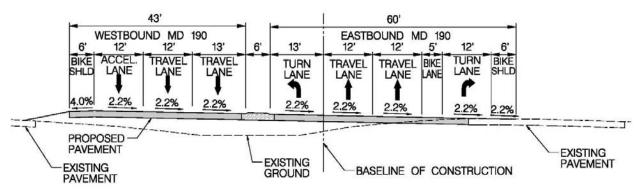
Alternative 1 - MD 190 Intersection West of Pyle Road
